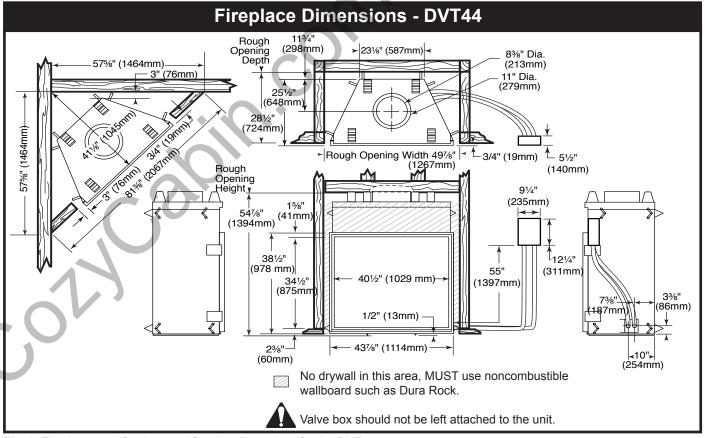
Fireplace specifications and framing dimensions for the DVT44.
